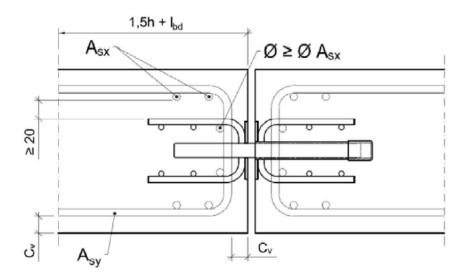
Arrangement of reinforcement at maximum slab thickness
